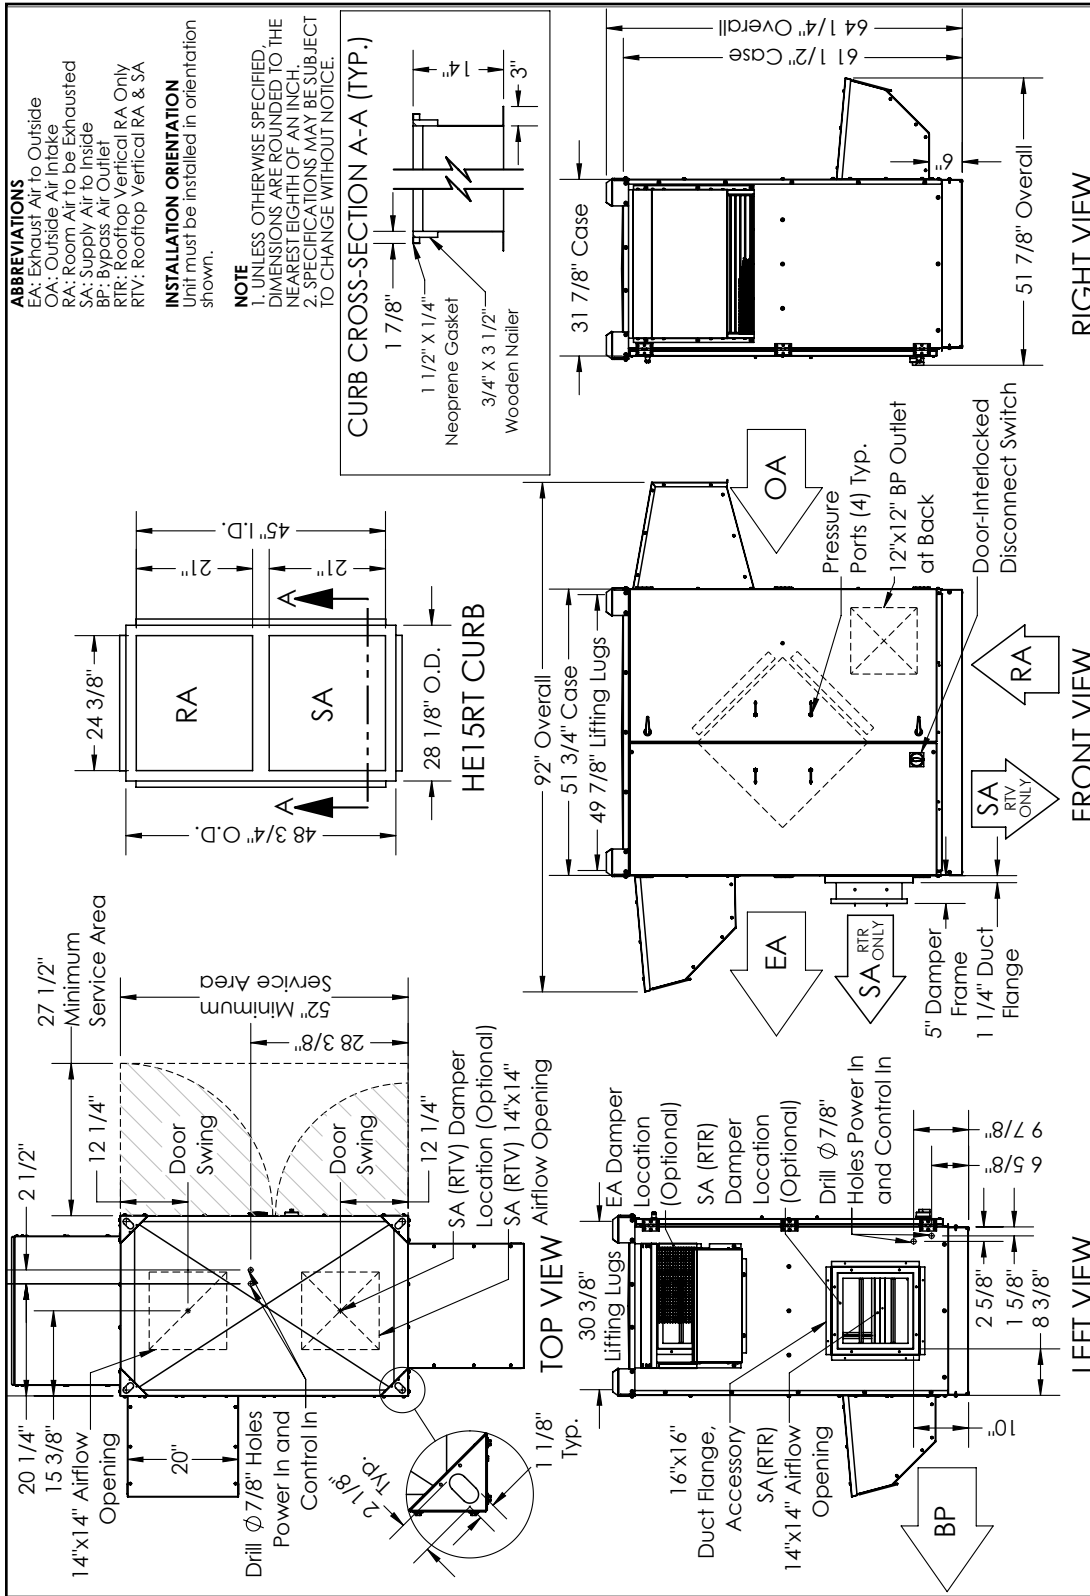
HE15RTR-V DIMENSION DRAWING
